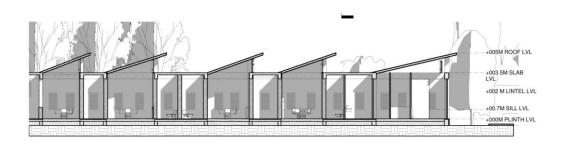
Northlight roof to eliminate west glare and bring diffused north light in class
